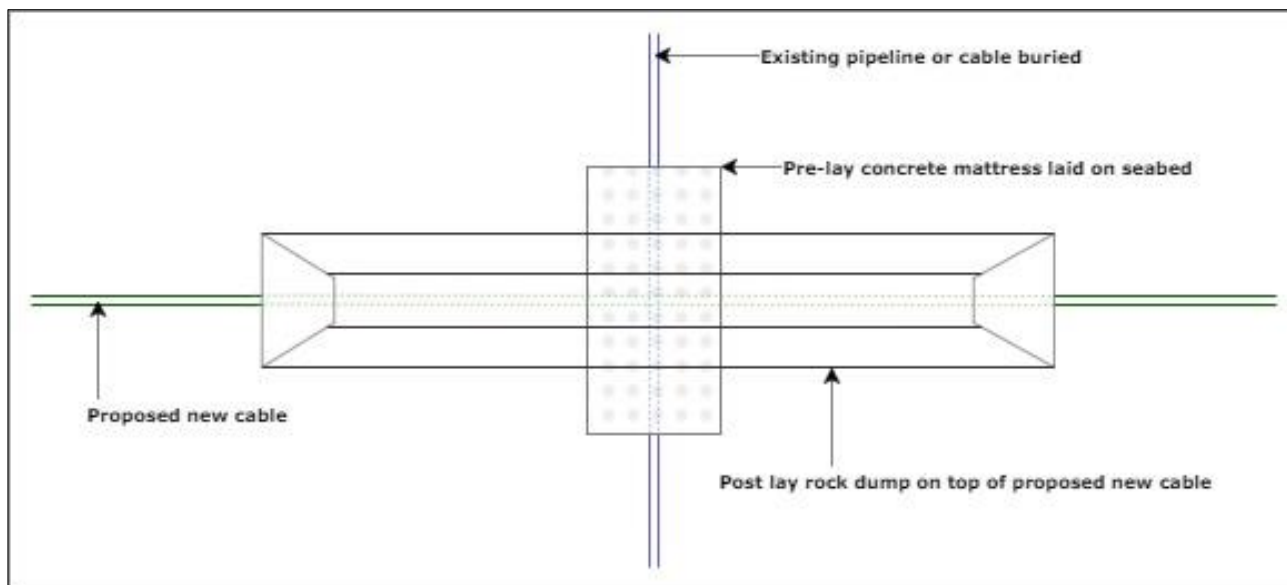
Typical Crossing with Concrete Mattress and Rock Berm
